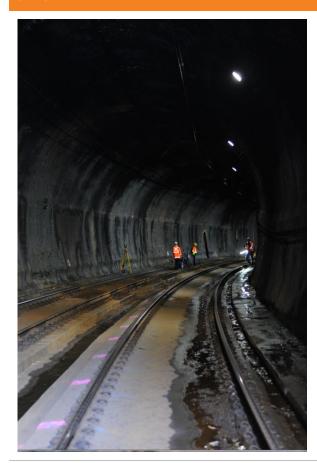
Tunnel 1, showing existing toe notching on the up track tunnel lining
